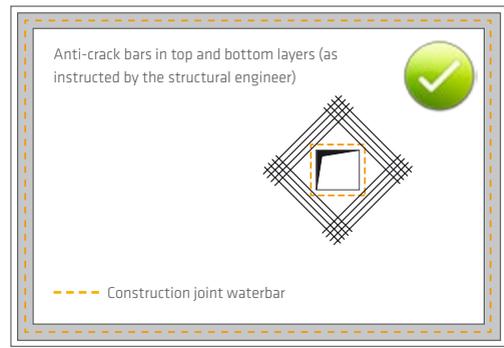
Crack reduction bars at box-out and shafts to prevent diagonal cracking
